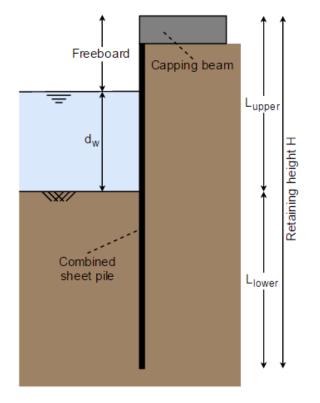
Schematic cross-section of sheet pile quay wall dimensions. Source: Own work
